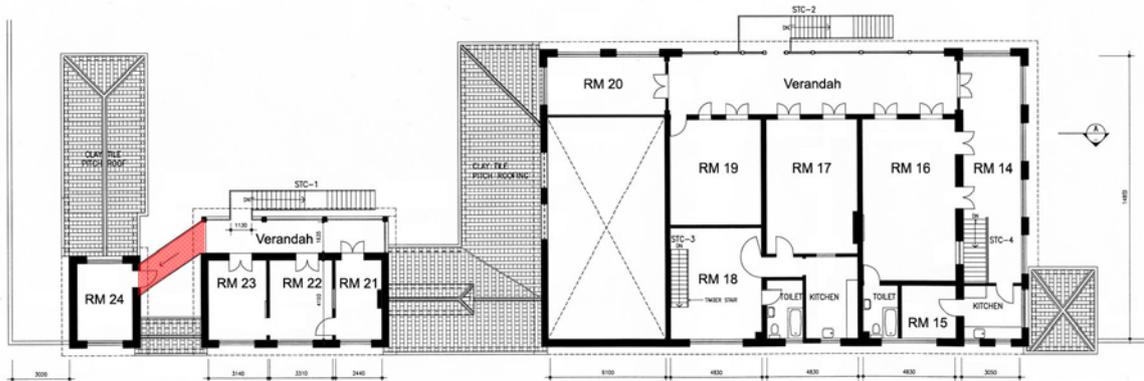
Location of the bridge on the ground floor at the former clubhouse (1:400).
